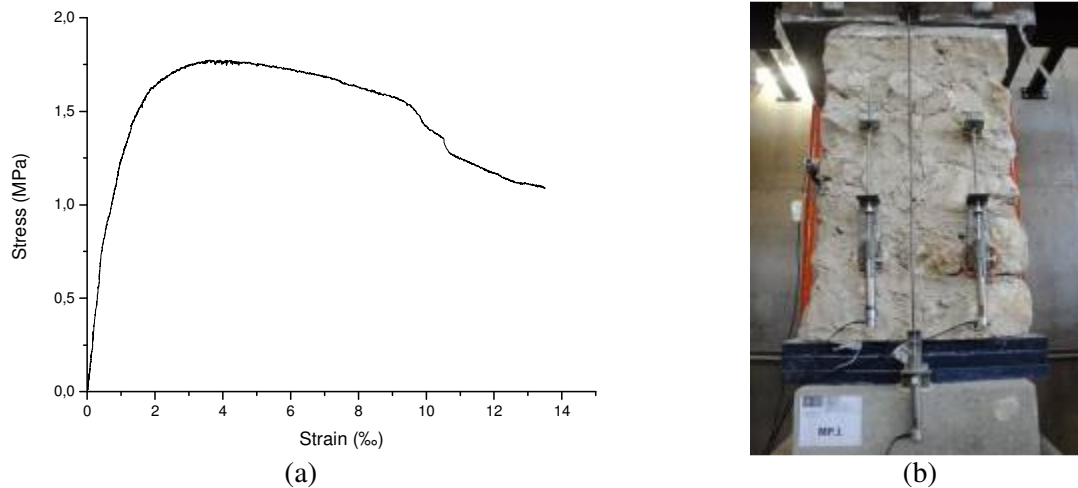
Compressive test: (a) Stress-strain diagram of a masonry prism; (b) instrumentation detail.
